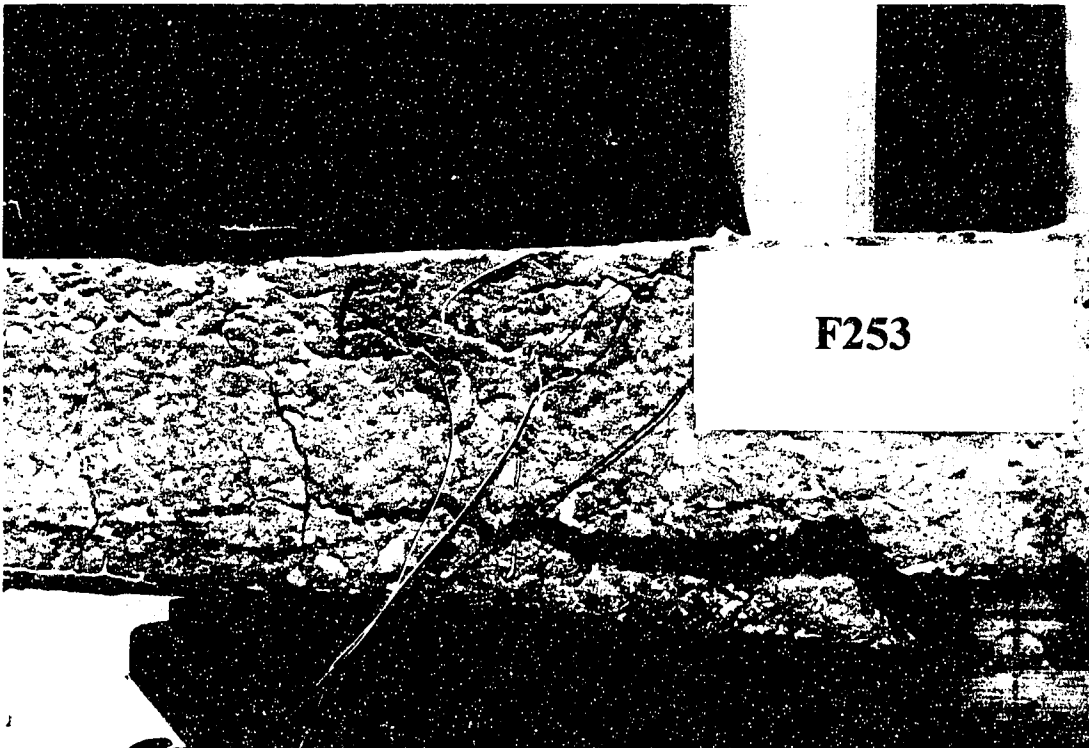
Photograph showing the mode of failure for beam F253 strengthened by 2 mm thick, 100 mm wide and 1100 mm long plate with 30 mm c/c spacing of stirrups
